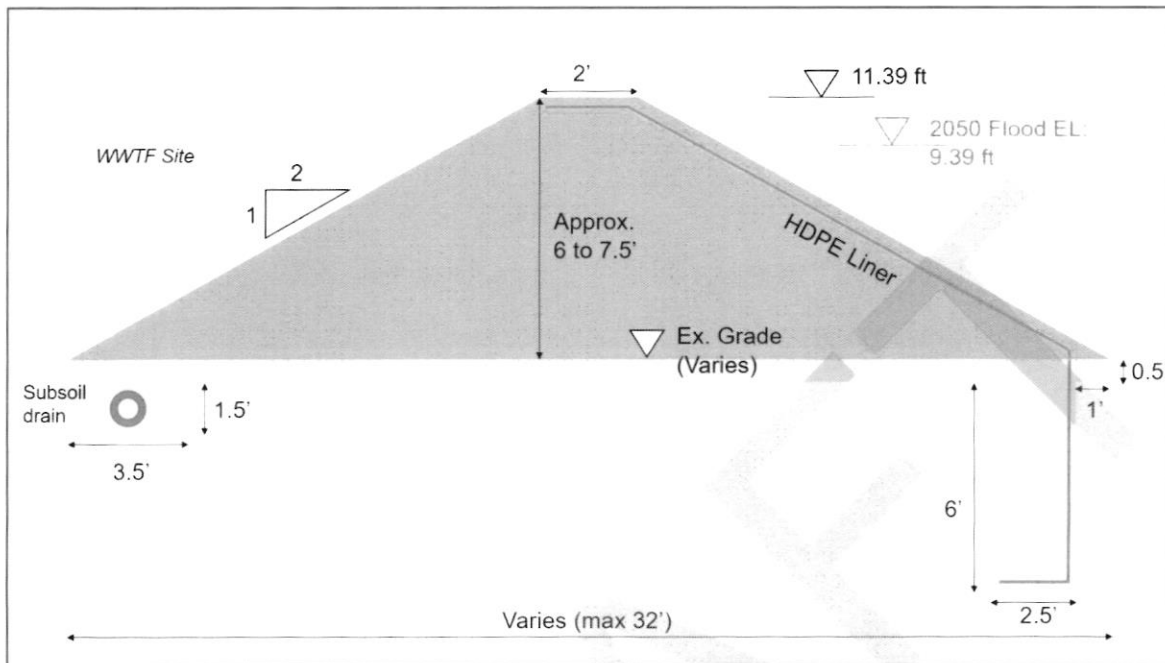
Option 1, Perimeter Flood Barrier Concept Arrangement, Typical Section
